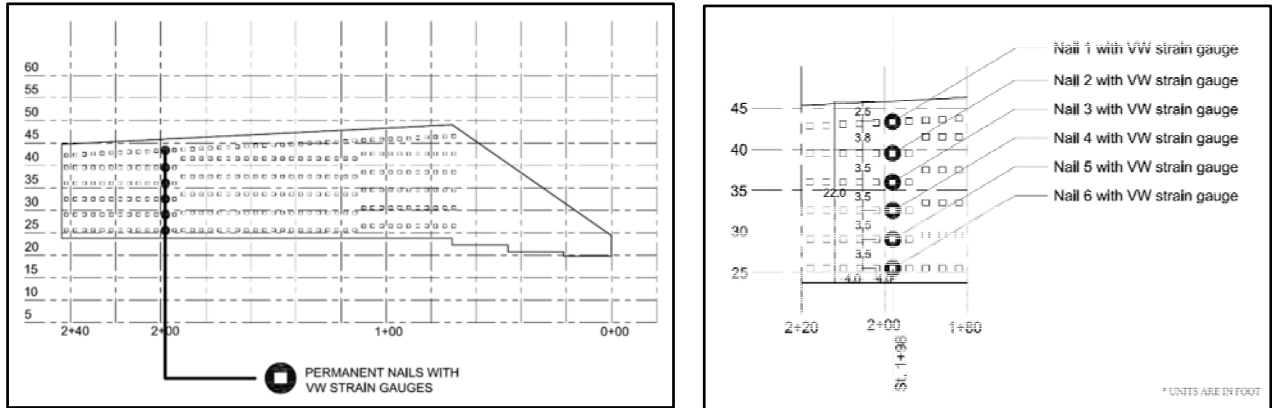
Location of the Instrumented Nails with VW Strain Gauges on Wall Profile at Station 1+98.
